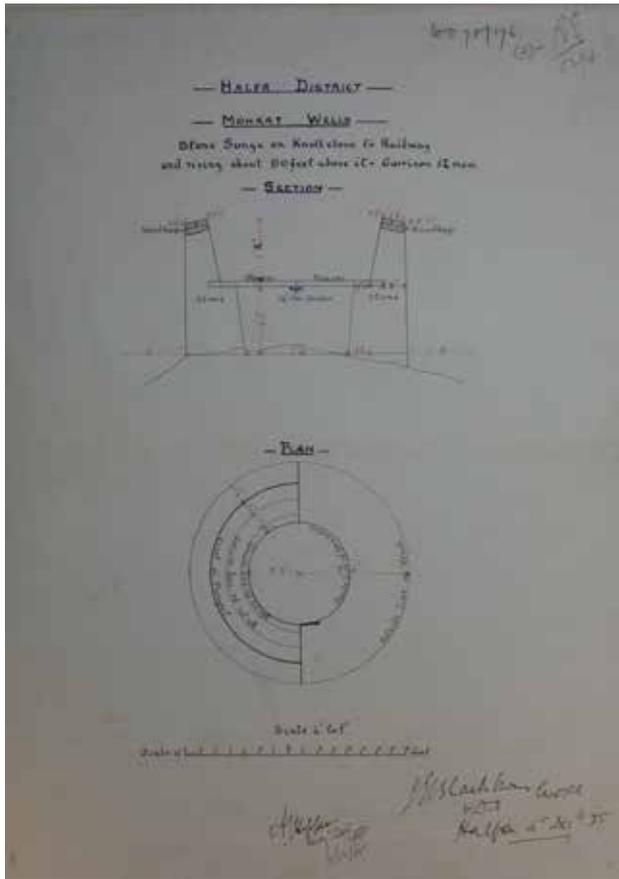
Murrat Wells. Plan and elevation of the 'sunga' drawn in 1885 (WO 78/176(2) Courtesy National Archive).
